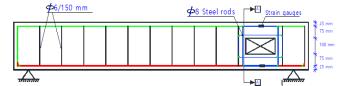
Detailing of reinforcement steel for strengthened beam (B9).
